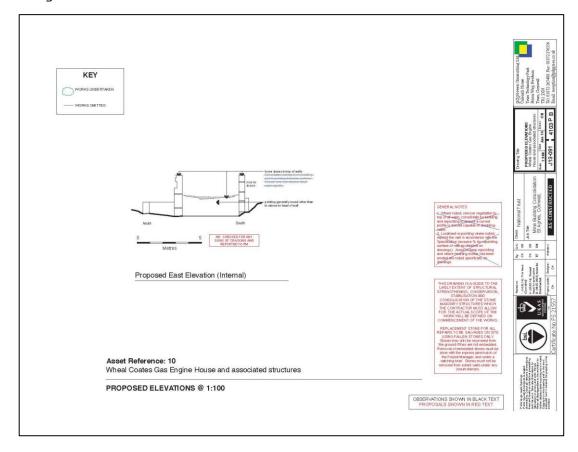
Internal eastern elevation of Wheal Coates gas engine house.
